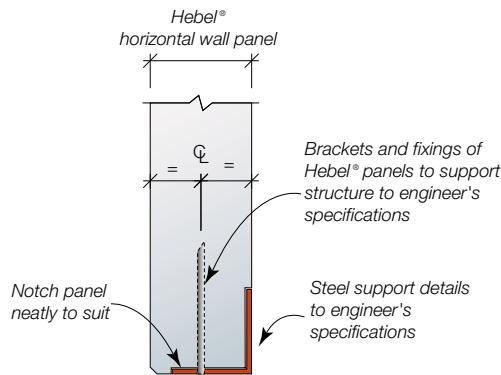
Horizontal wall panel & concrete/masonry base support detail (elevation).
